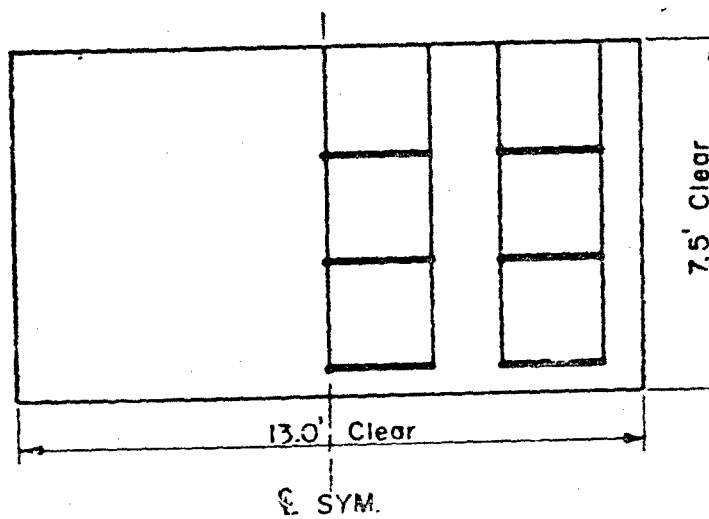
VERTICAL SECTION THROUGH BUNKS
